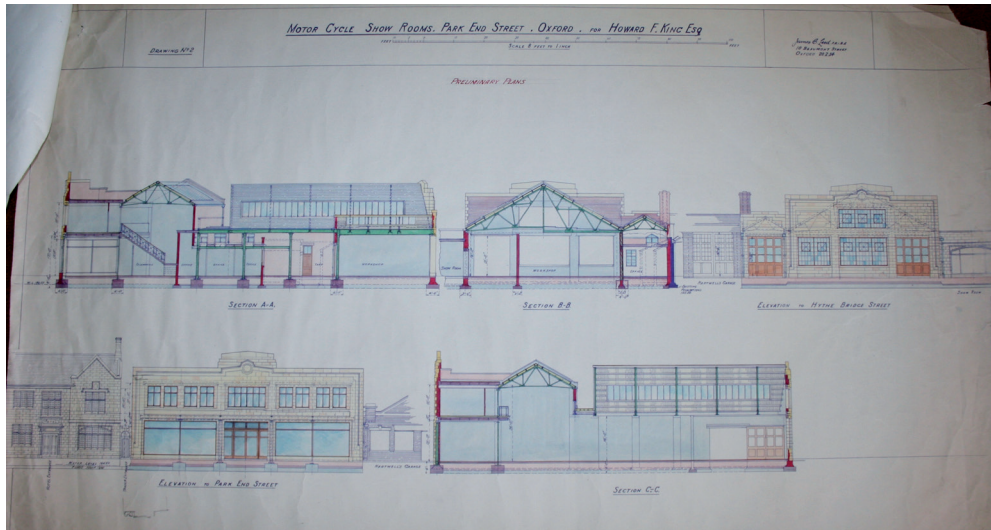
Leed's design for the King's showroom which stretched back to Hythe Bridge Street. It was, once again, a steel and concrete construction behind more elegant façades. CCA, Maps St Thomas 40.
